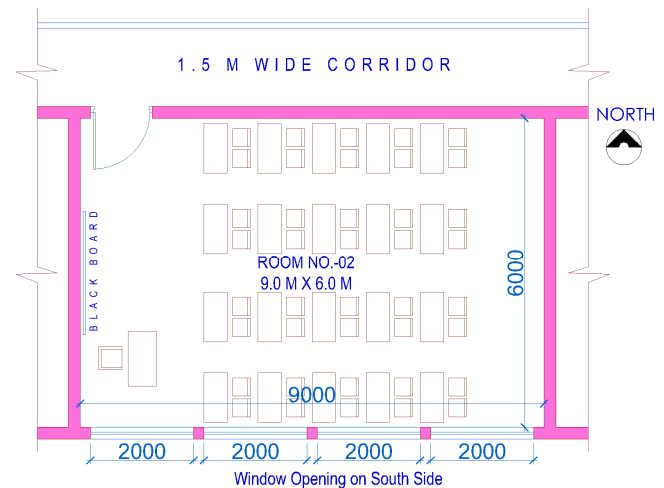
Plan of Room No.2 with a south-oriented opening.
